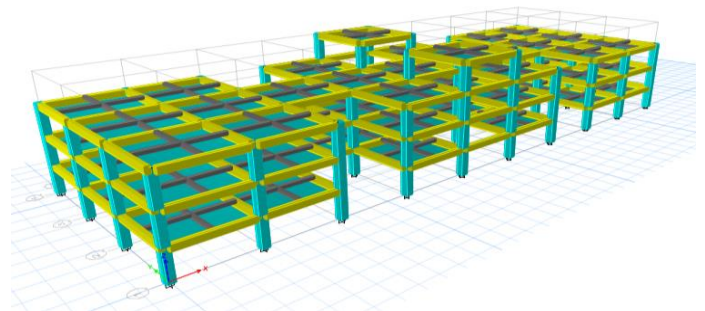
Symmetric 15 Bedded Hospital Building 3D Frame
